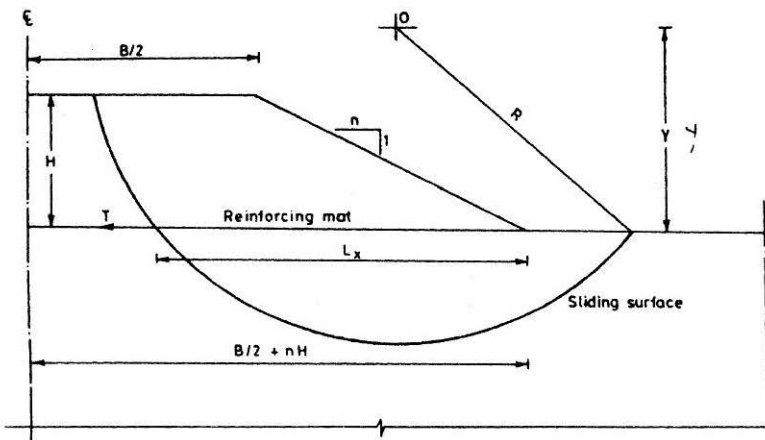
Rotational Slope-Foundation Failure of a Typical Reinforced Embankment
